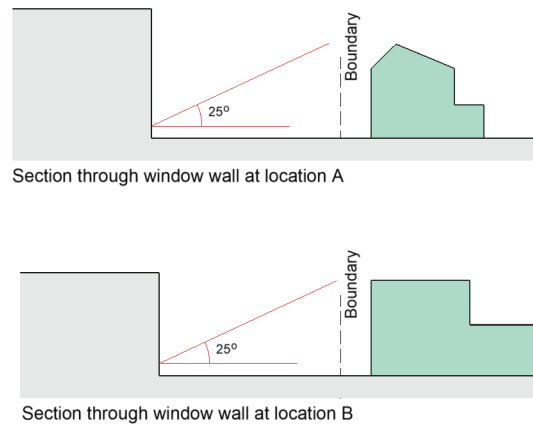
Section perpendicular to window wall at locations indicated in Figure 2
